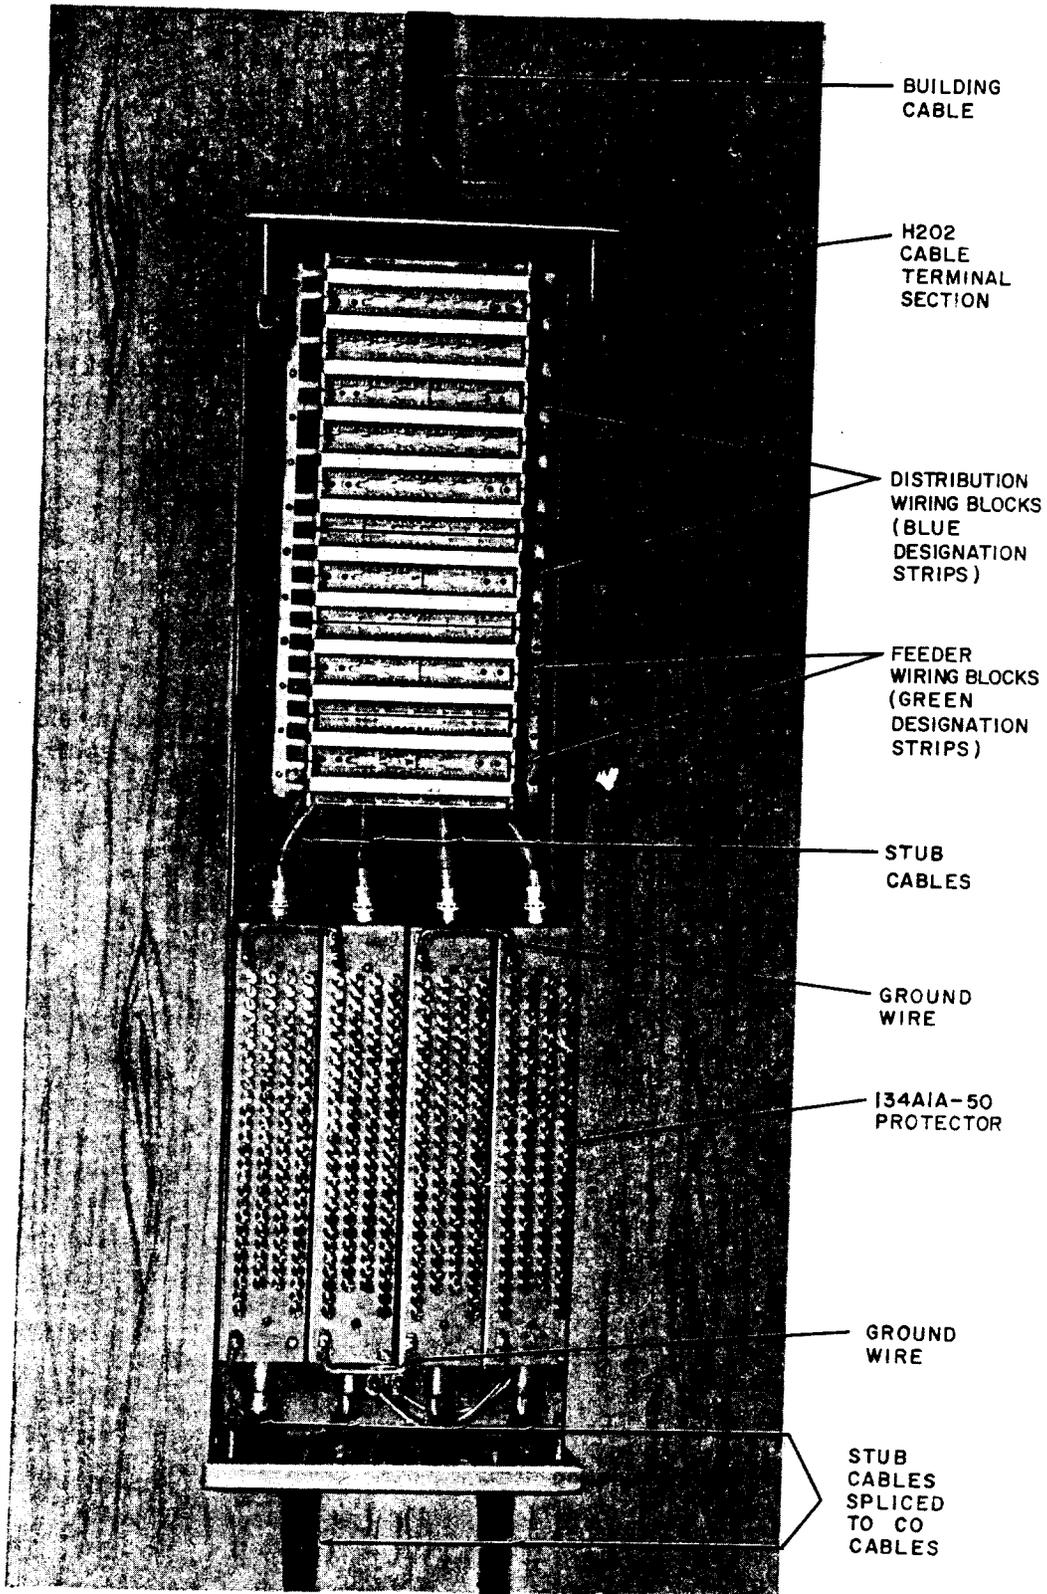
200-Pair Exposed Entrance Cable—400-Pair Building Cable
